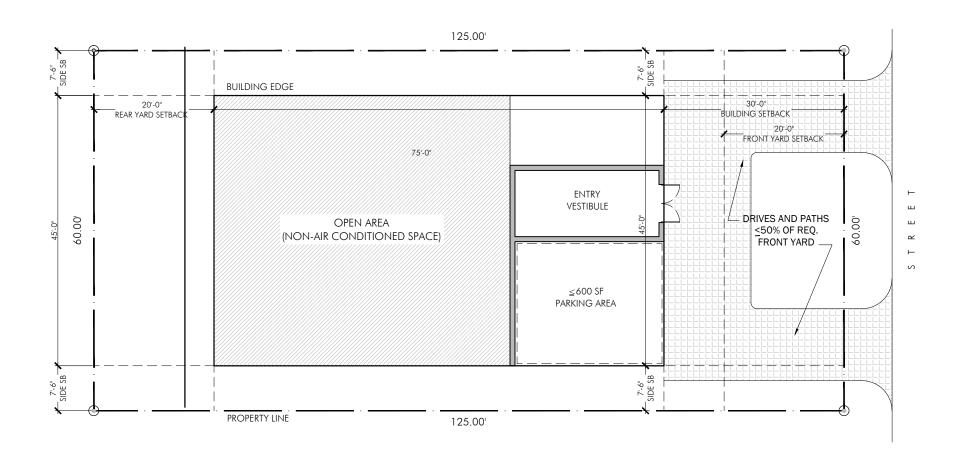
EXHIBIT C: EXISTING CODE 60' LOT (SECTION)
